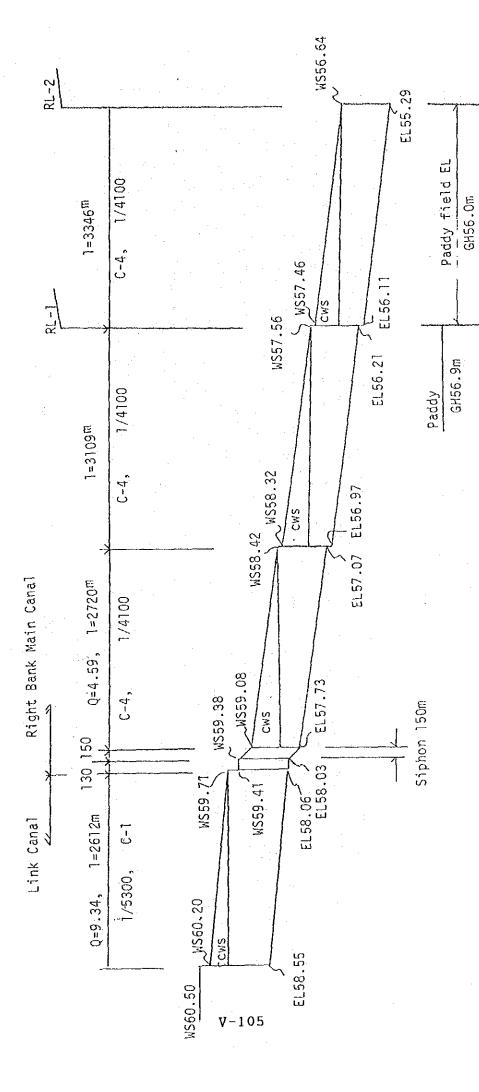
Profile of Right Bank Main Canal & Paddy Field Elevation
